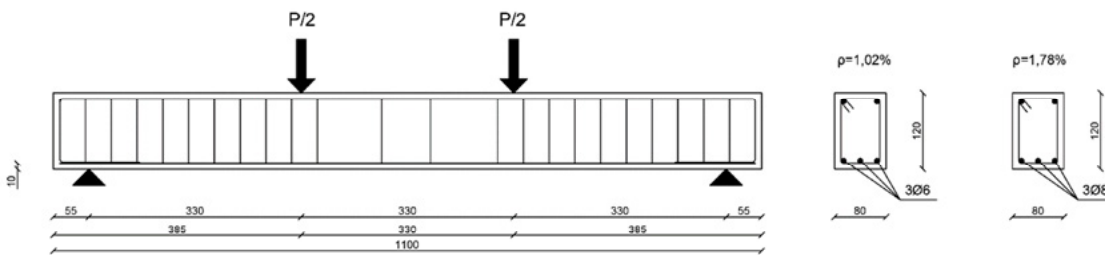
Static scheme and the arrangement of reinforcement in reinforced concrete beams
